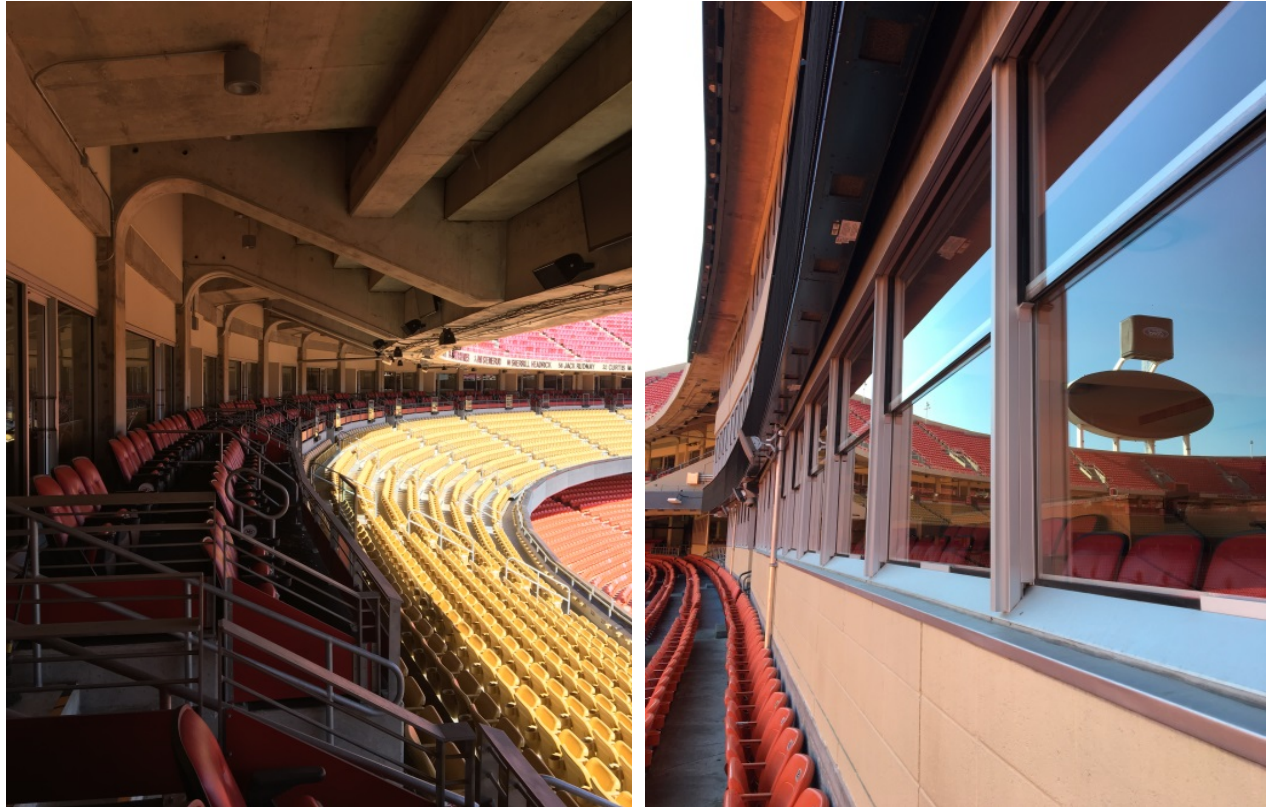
Internal Windows, Storefront, and Sliding Glass Wall System
